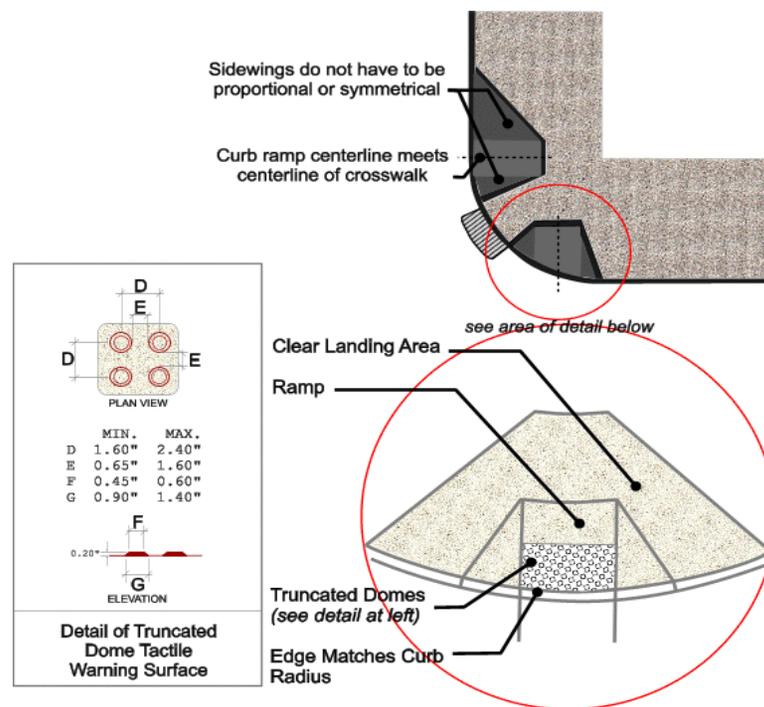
Detail of an ADA-complaint curb ramp design with truncated dome measurements.
